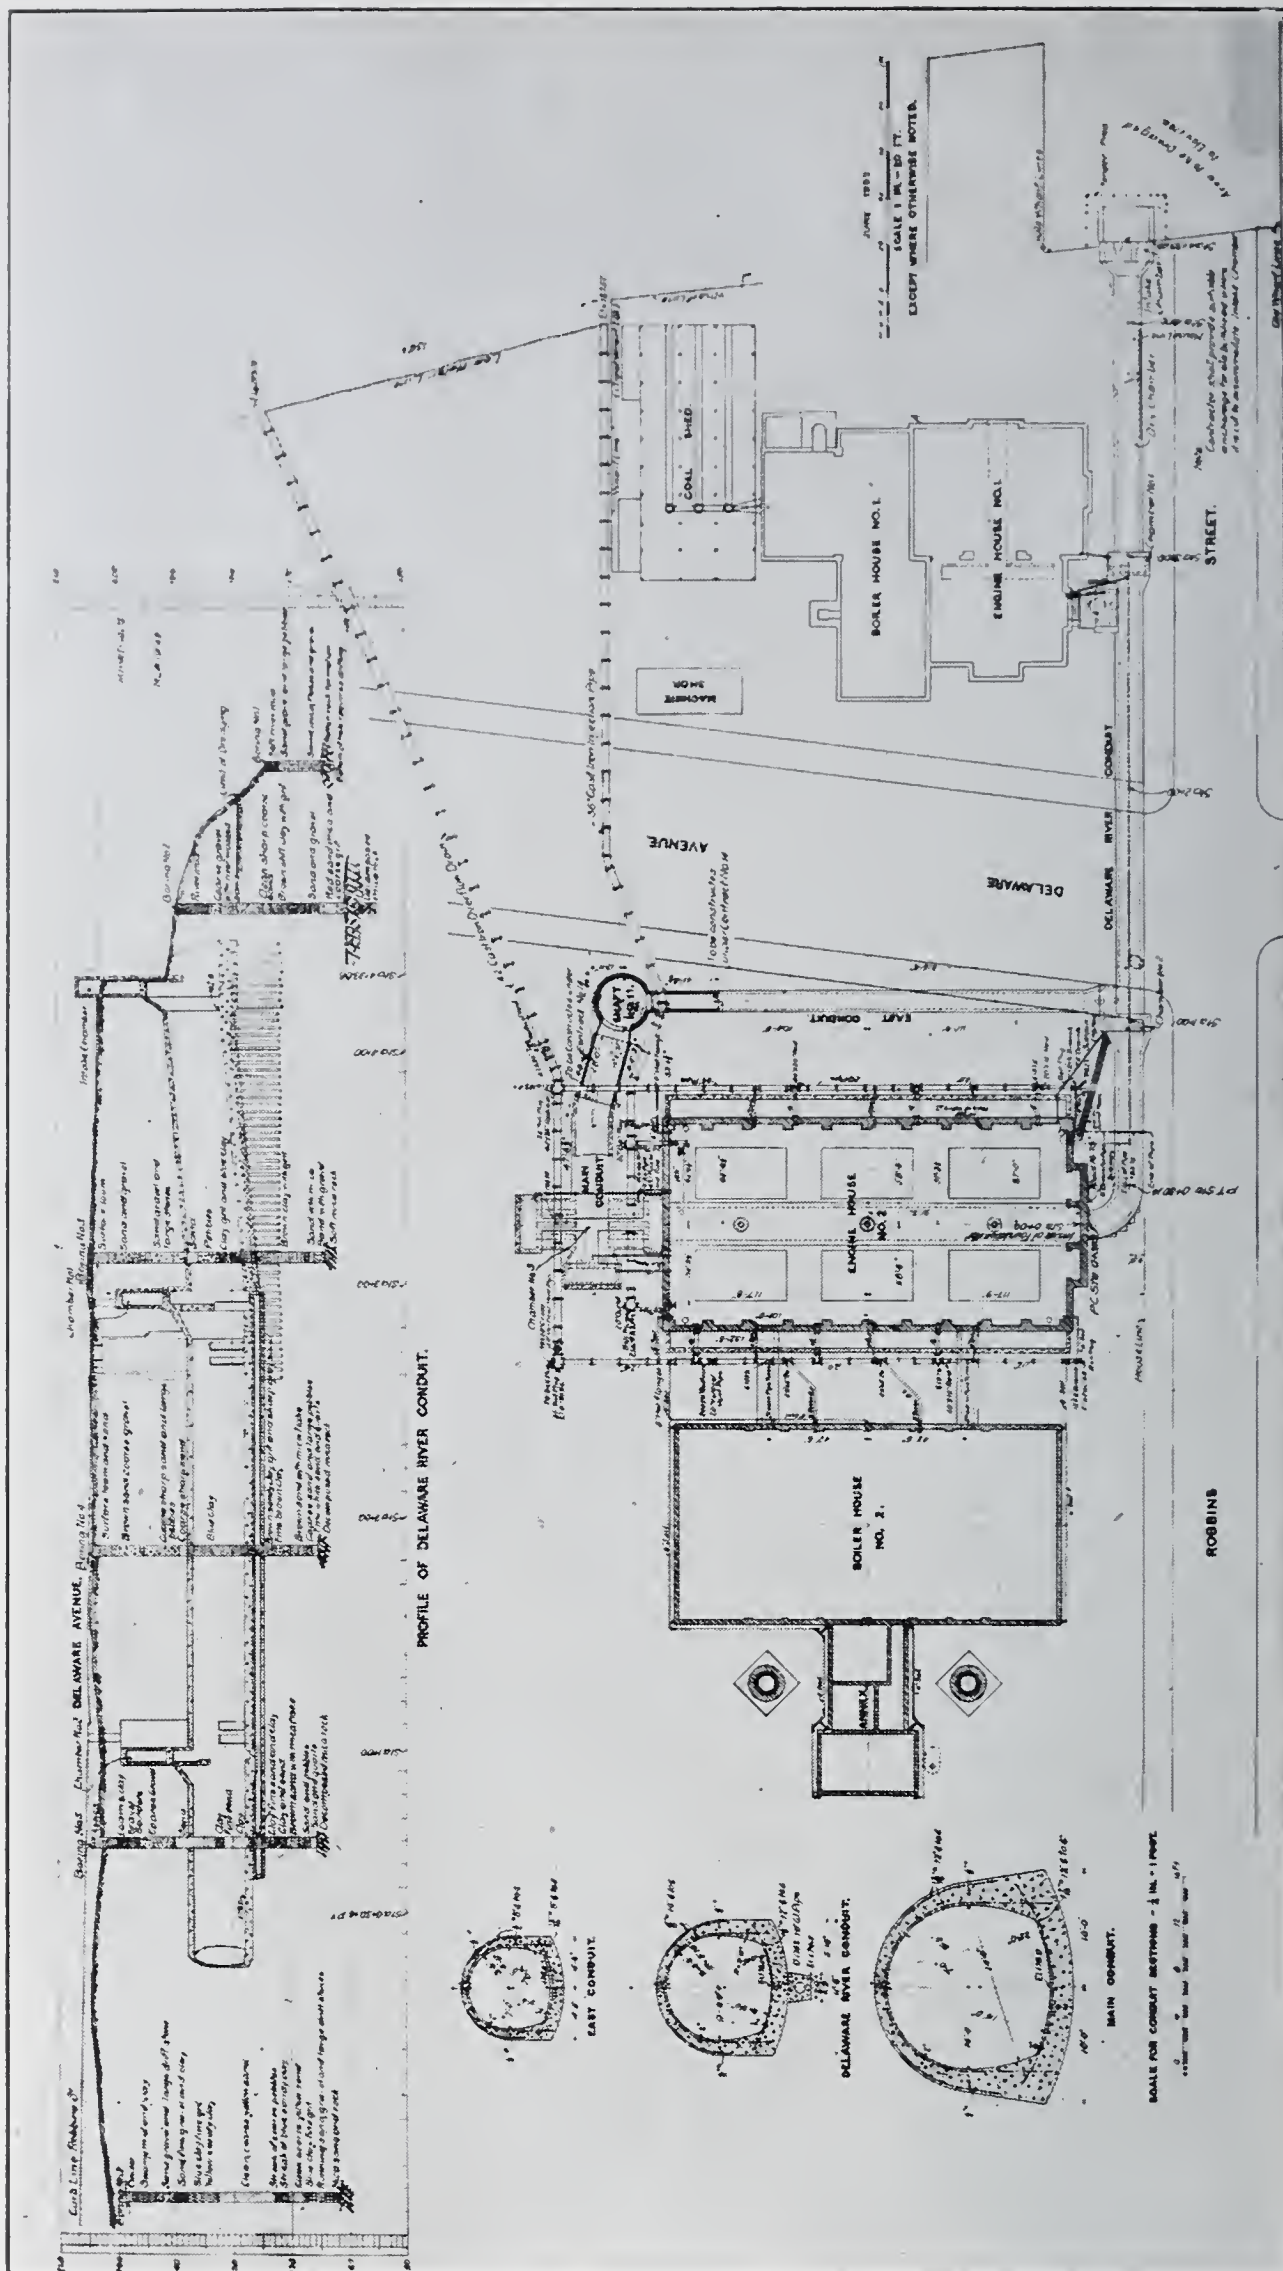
LARDNER'S POINT PUMPING STATION—CONDUITS AND PIPING.
